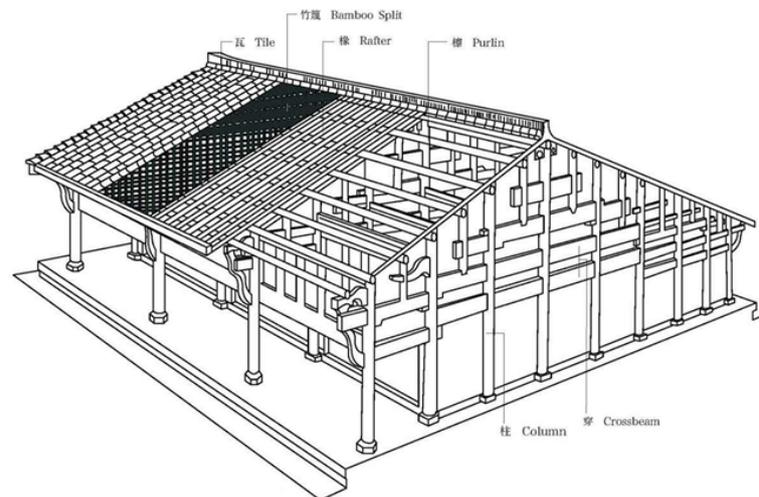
Axonometric and sectional views of the column-and-tie timber framework (chuan dou style),
